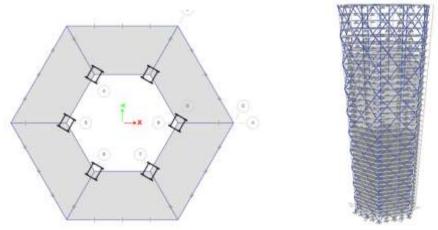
Modelling of hexagonal plan geometry diagrid plan
